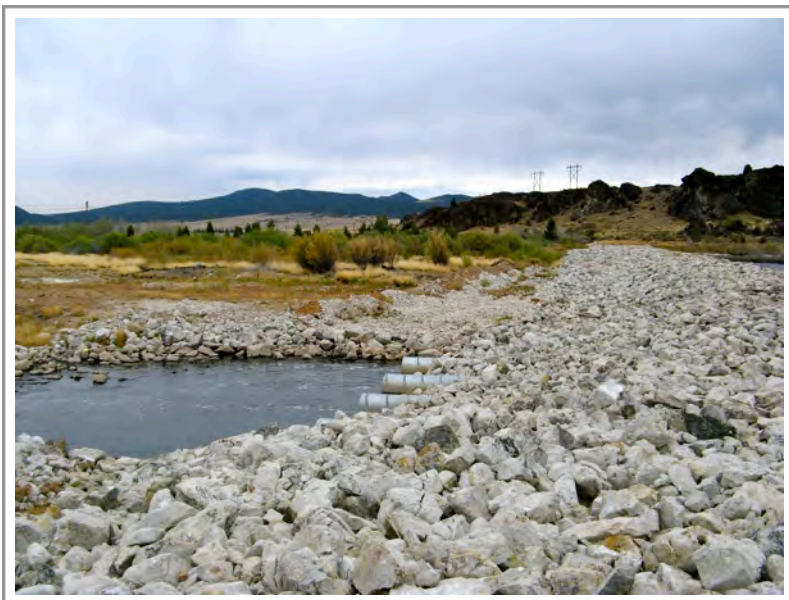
Lower section of Subarea 3—face of temporary sediment retention dam along with outflow culverts
